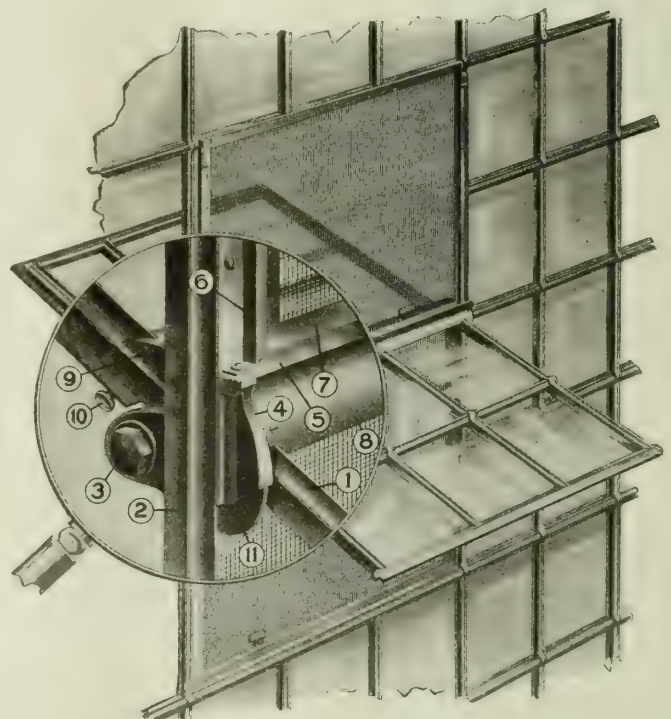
DETAILS SHOWING APPLICATION OF BURROWES SCREENS TO CASEMENT WINDOWS
